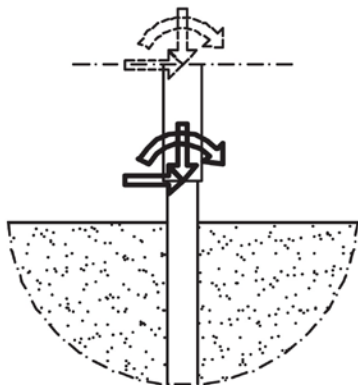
Load configuration of a sub-structure with monopod foundation.
